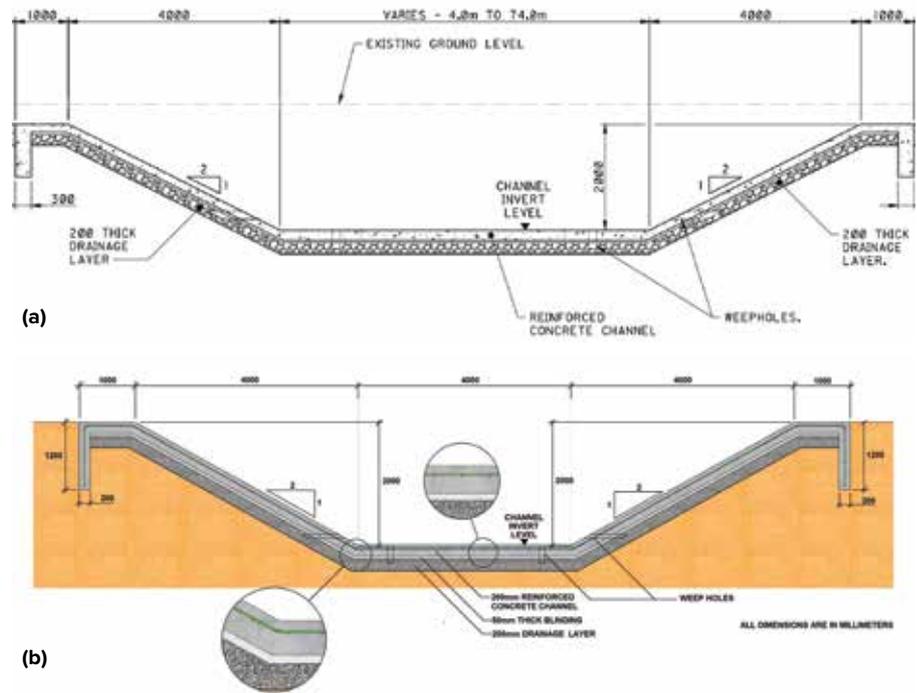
The flood mitigation channel: (a) cross section showing the original design with epoxy-coated steel (ECS) bars; and (b) cross section at the upstream end, showing the revised design with GFRP bars (Note: 1 m = 3.3 ft; 1 mm = 0.04 in.)
